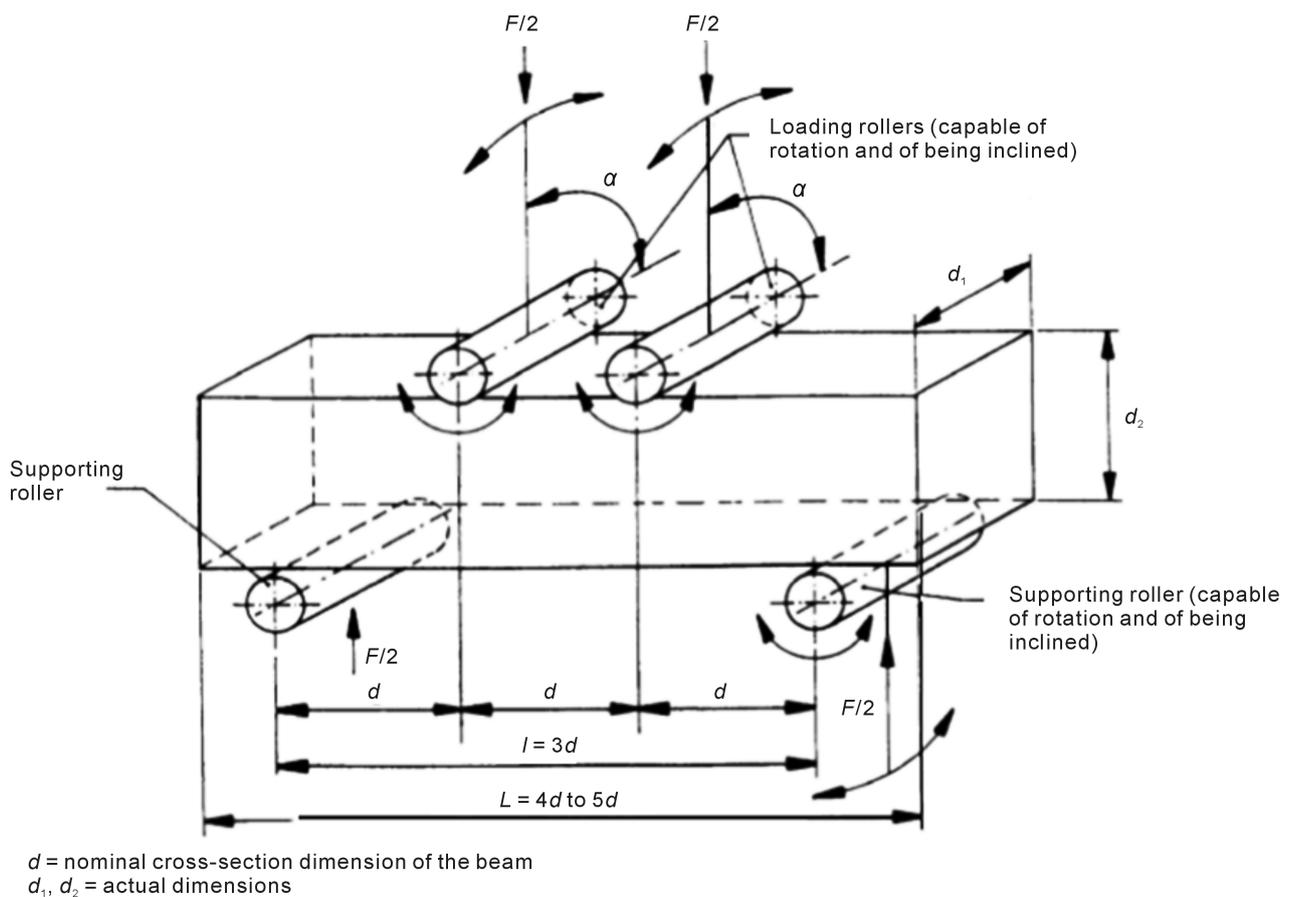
Arrangement of two-point loading of test specimen (Source: BS EN 12390-5:2000).
